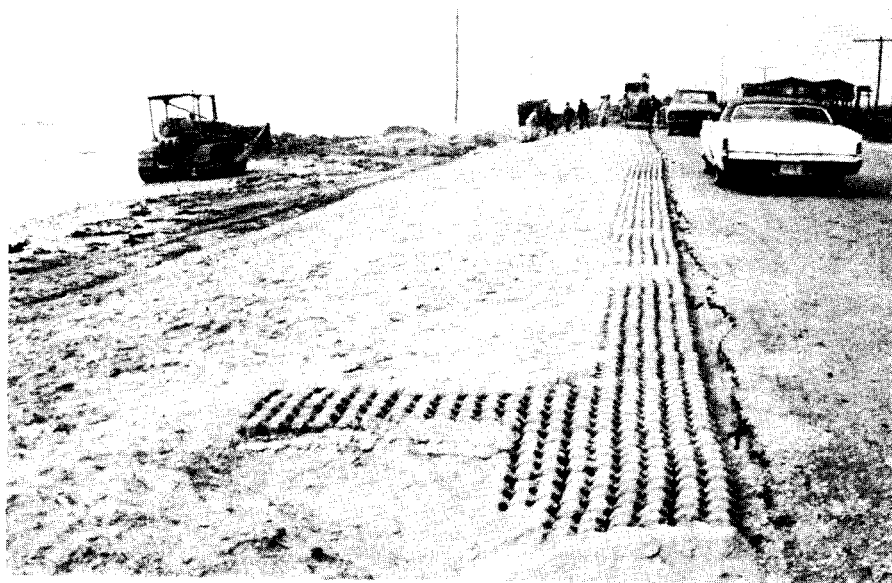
View of Same Site After Installation of Cellular Concrete Block Revetment Tests. The blocks were covered with beach sand to act as a dry mortar. The gap between the blocks and the pavement edge was filled with asphalt. The installation consisted of two test sections 100 feet long by 30 feet wide. One section (foreground) was over a 300-micron mesh plastic filter and the other (background) was over a 170-micron mesh plastic filter.
